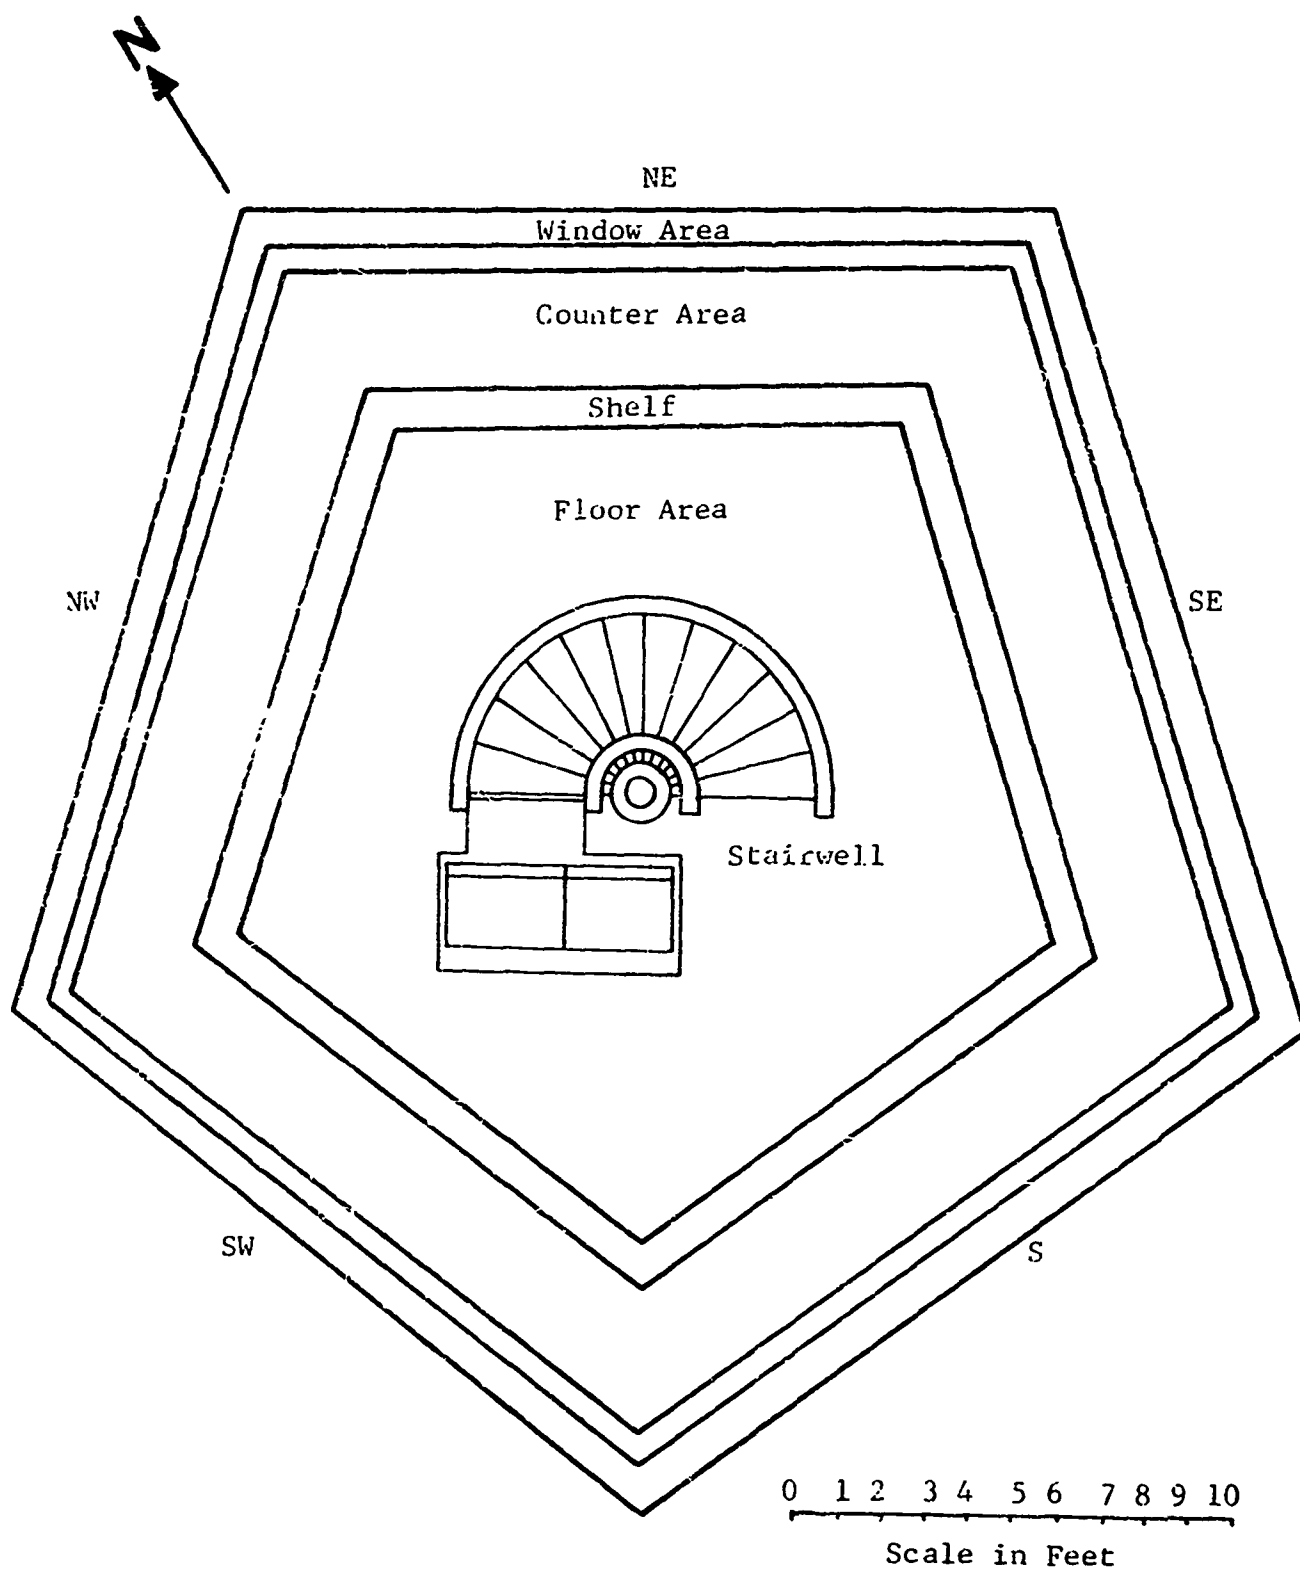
PLAN OF NEW O'HARE FIELD C-2A 5-SIDED CAB
